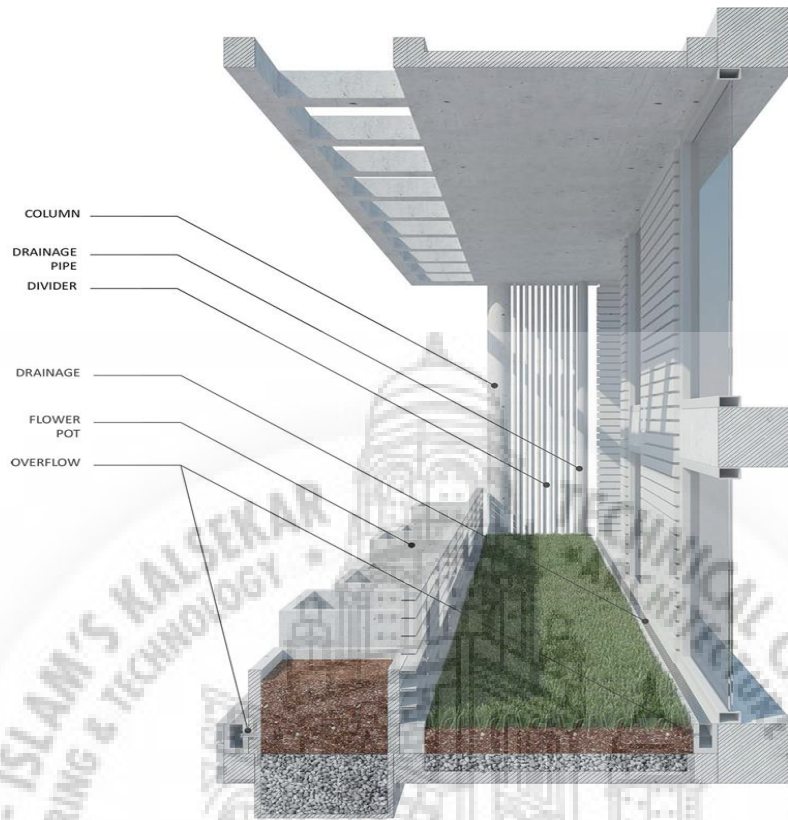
Magic Breeze Villa Detailed Section (Source – Arcdaily)
